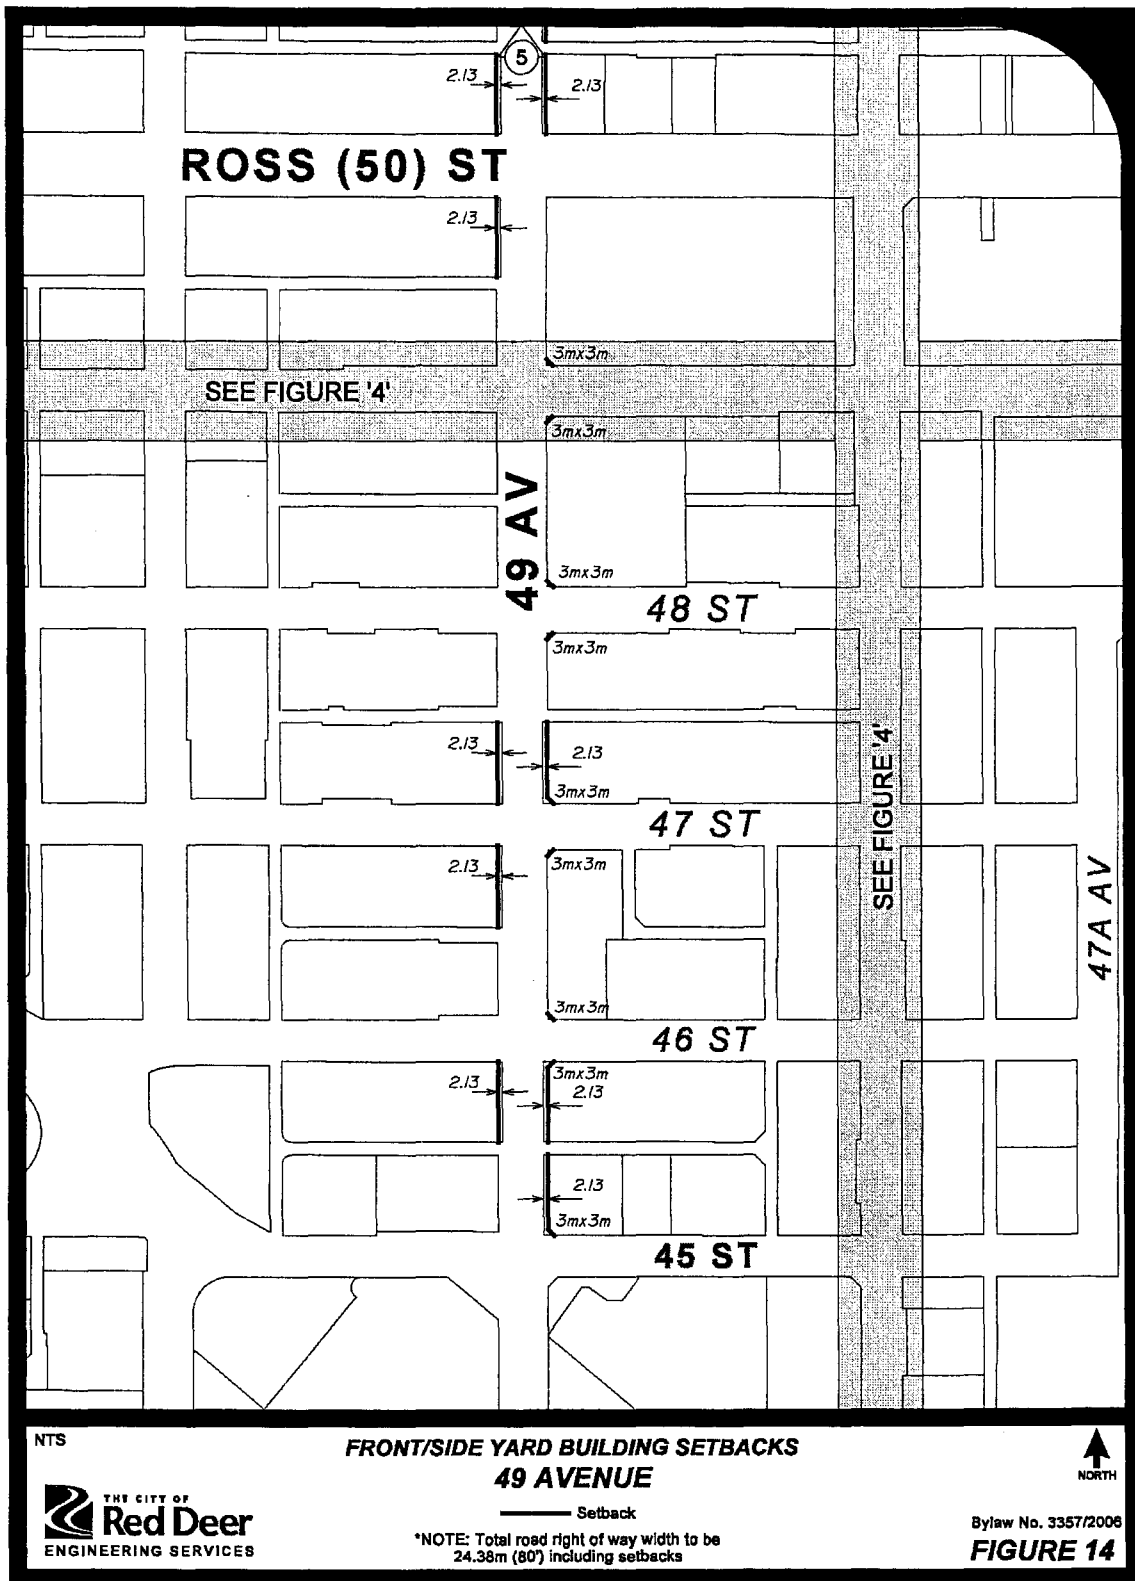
Front/Side Yard Building Setbacks 49 Avenue
